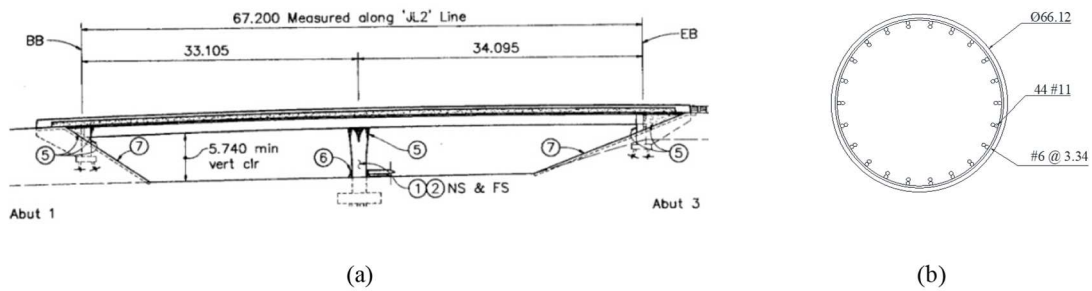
(a) Elevation view of the Jack Tone Road overcrossing Kaviani et al. 2014; (b) cross-section of the column.
